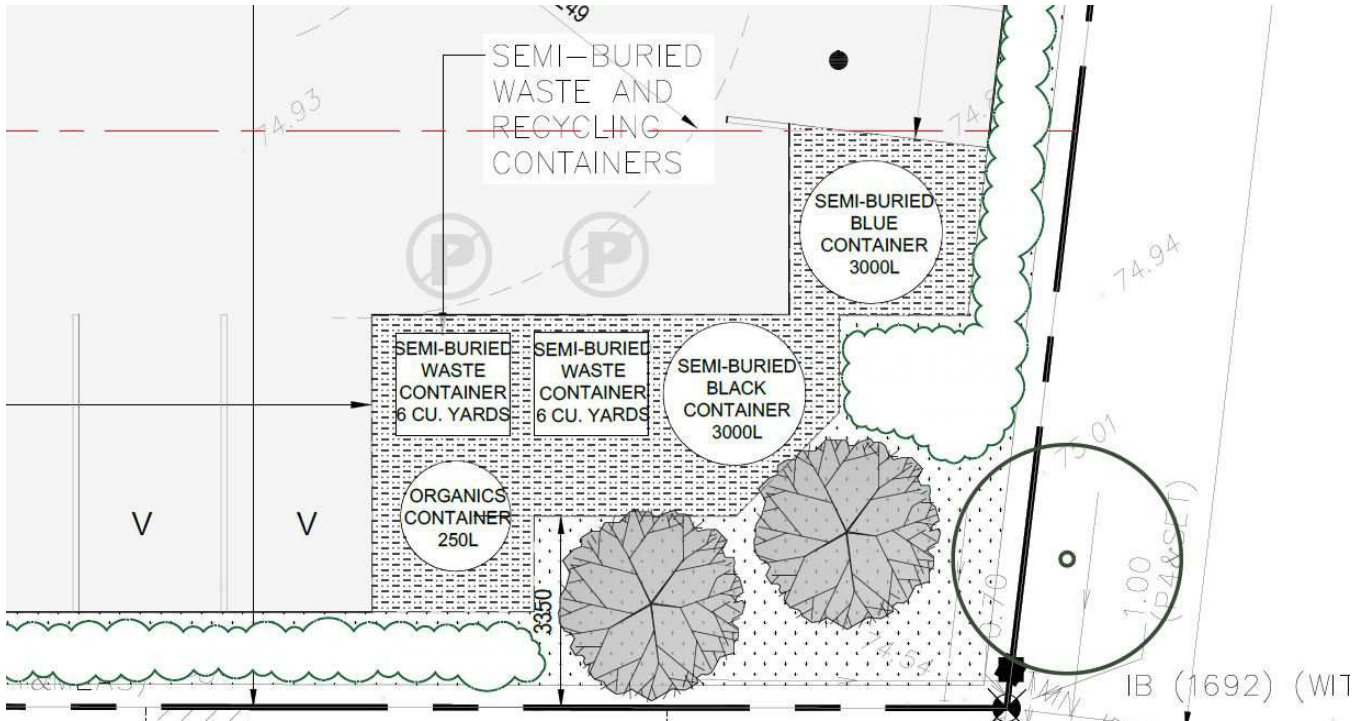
Proposed refused collection area screened and setback from abutting properties.
